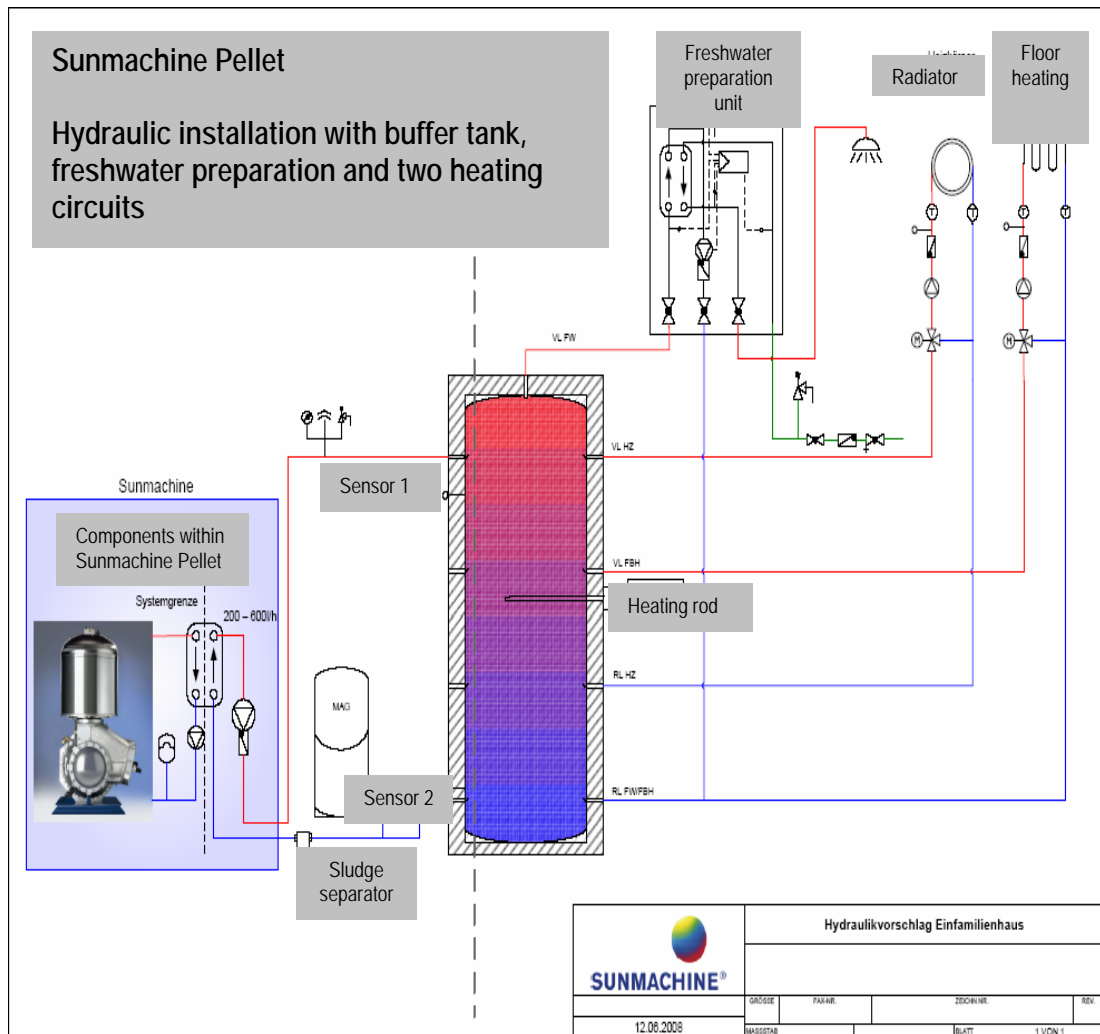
³⁵: Scheme of a hydraulic installation of a CHP - system within a single family house
